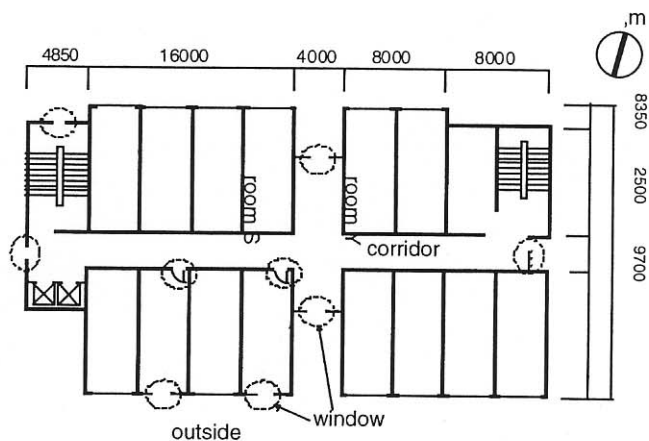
Plan view of the fourth floor of the building used. The two rooms (shaded) were used for the experiment. All windows are opened when the room is naturally ventilated.
